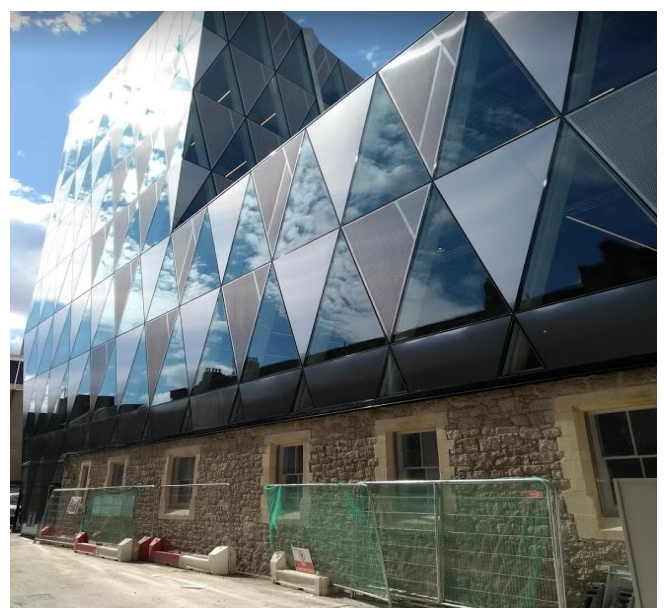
View of the new façade over the existing Lecture Hall structure along Old Abbey Street – photo by author.
